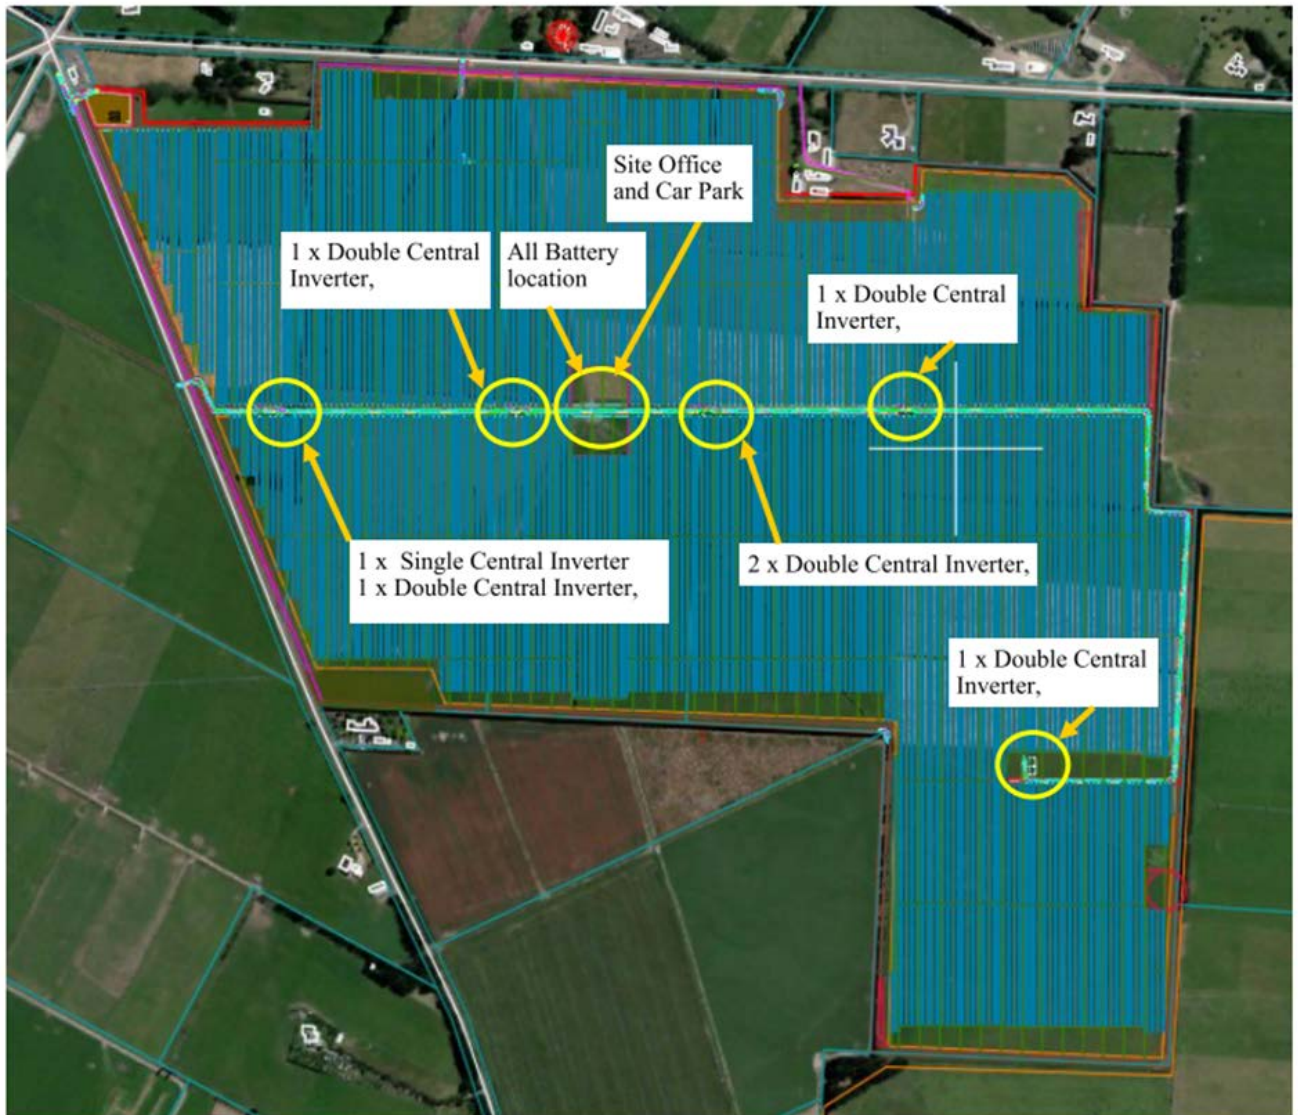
Proposed Site Layout and Battery Plan (Source: Applicant's s92 response, dated 20th October 2023)
